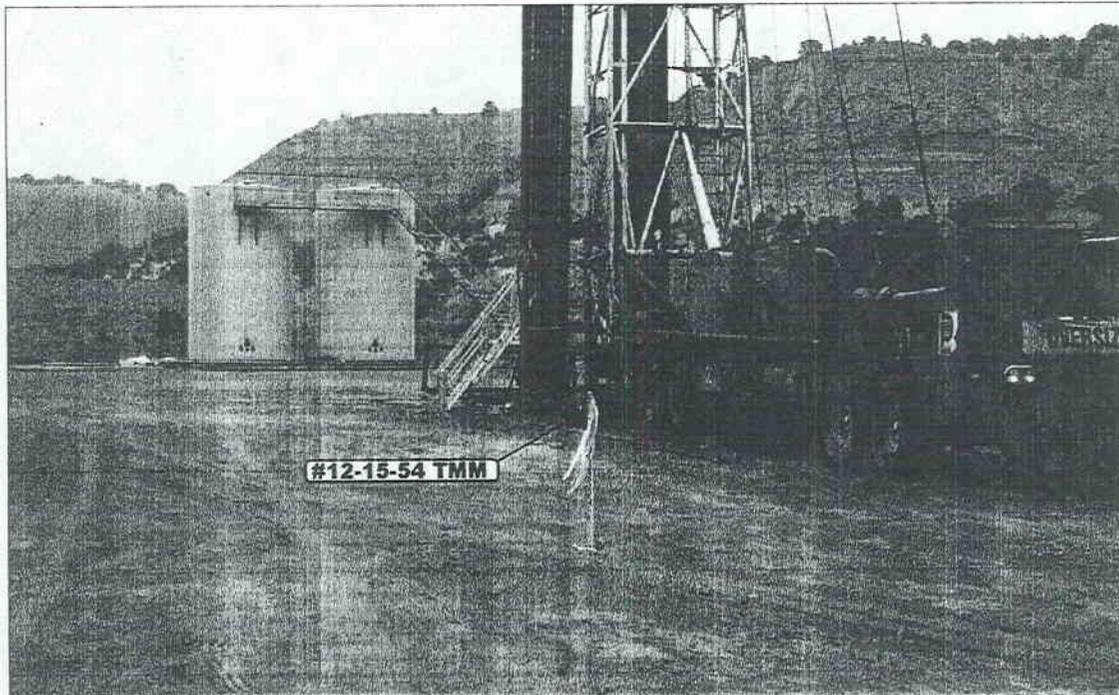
PHOTO: VIEW OF EXISTING AND PROPOSED WELL LOCATIONS
